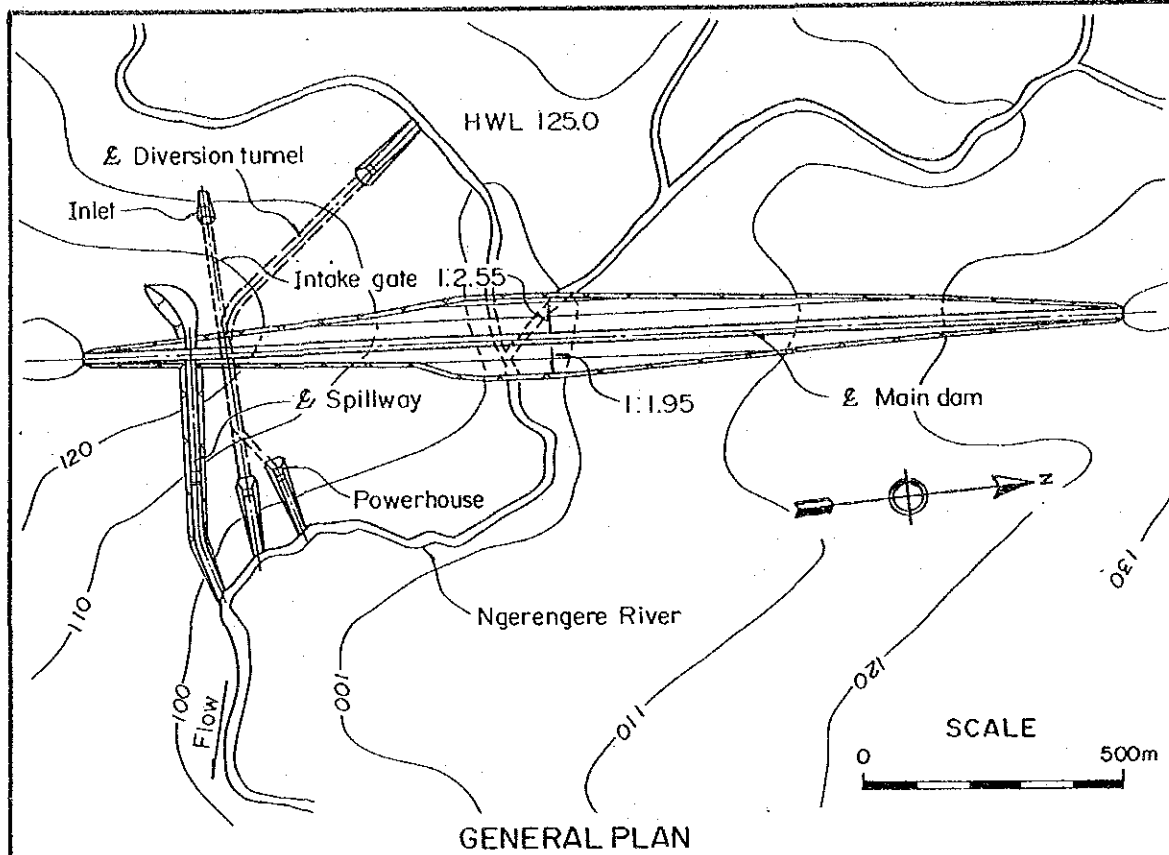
LAYOUT PLAN OF NGERENGERE DAM PROJECT
